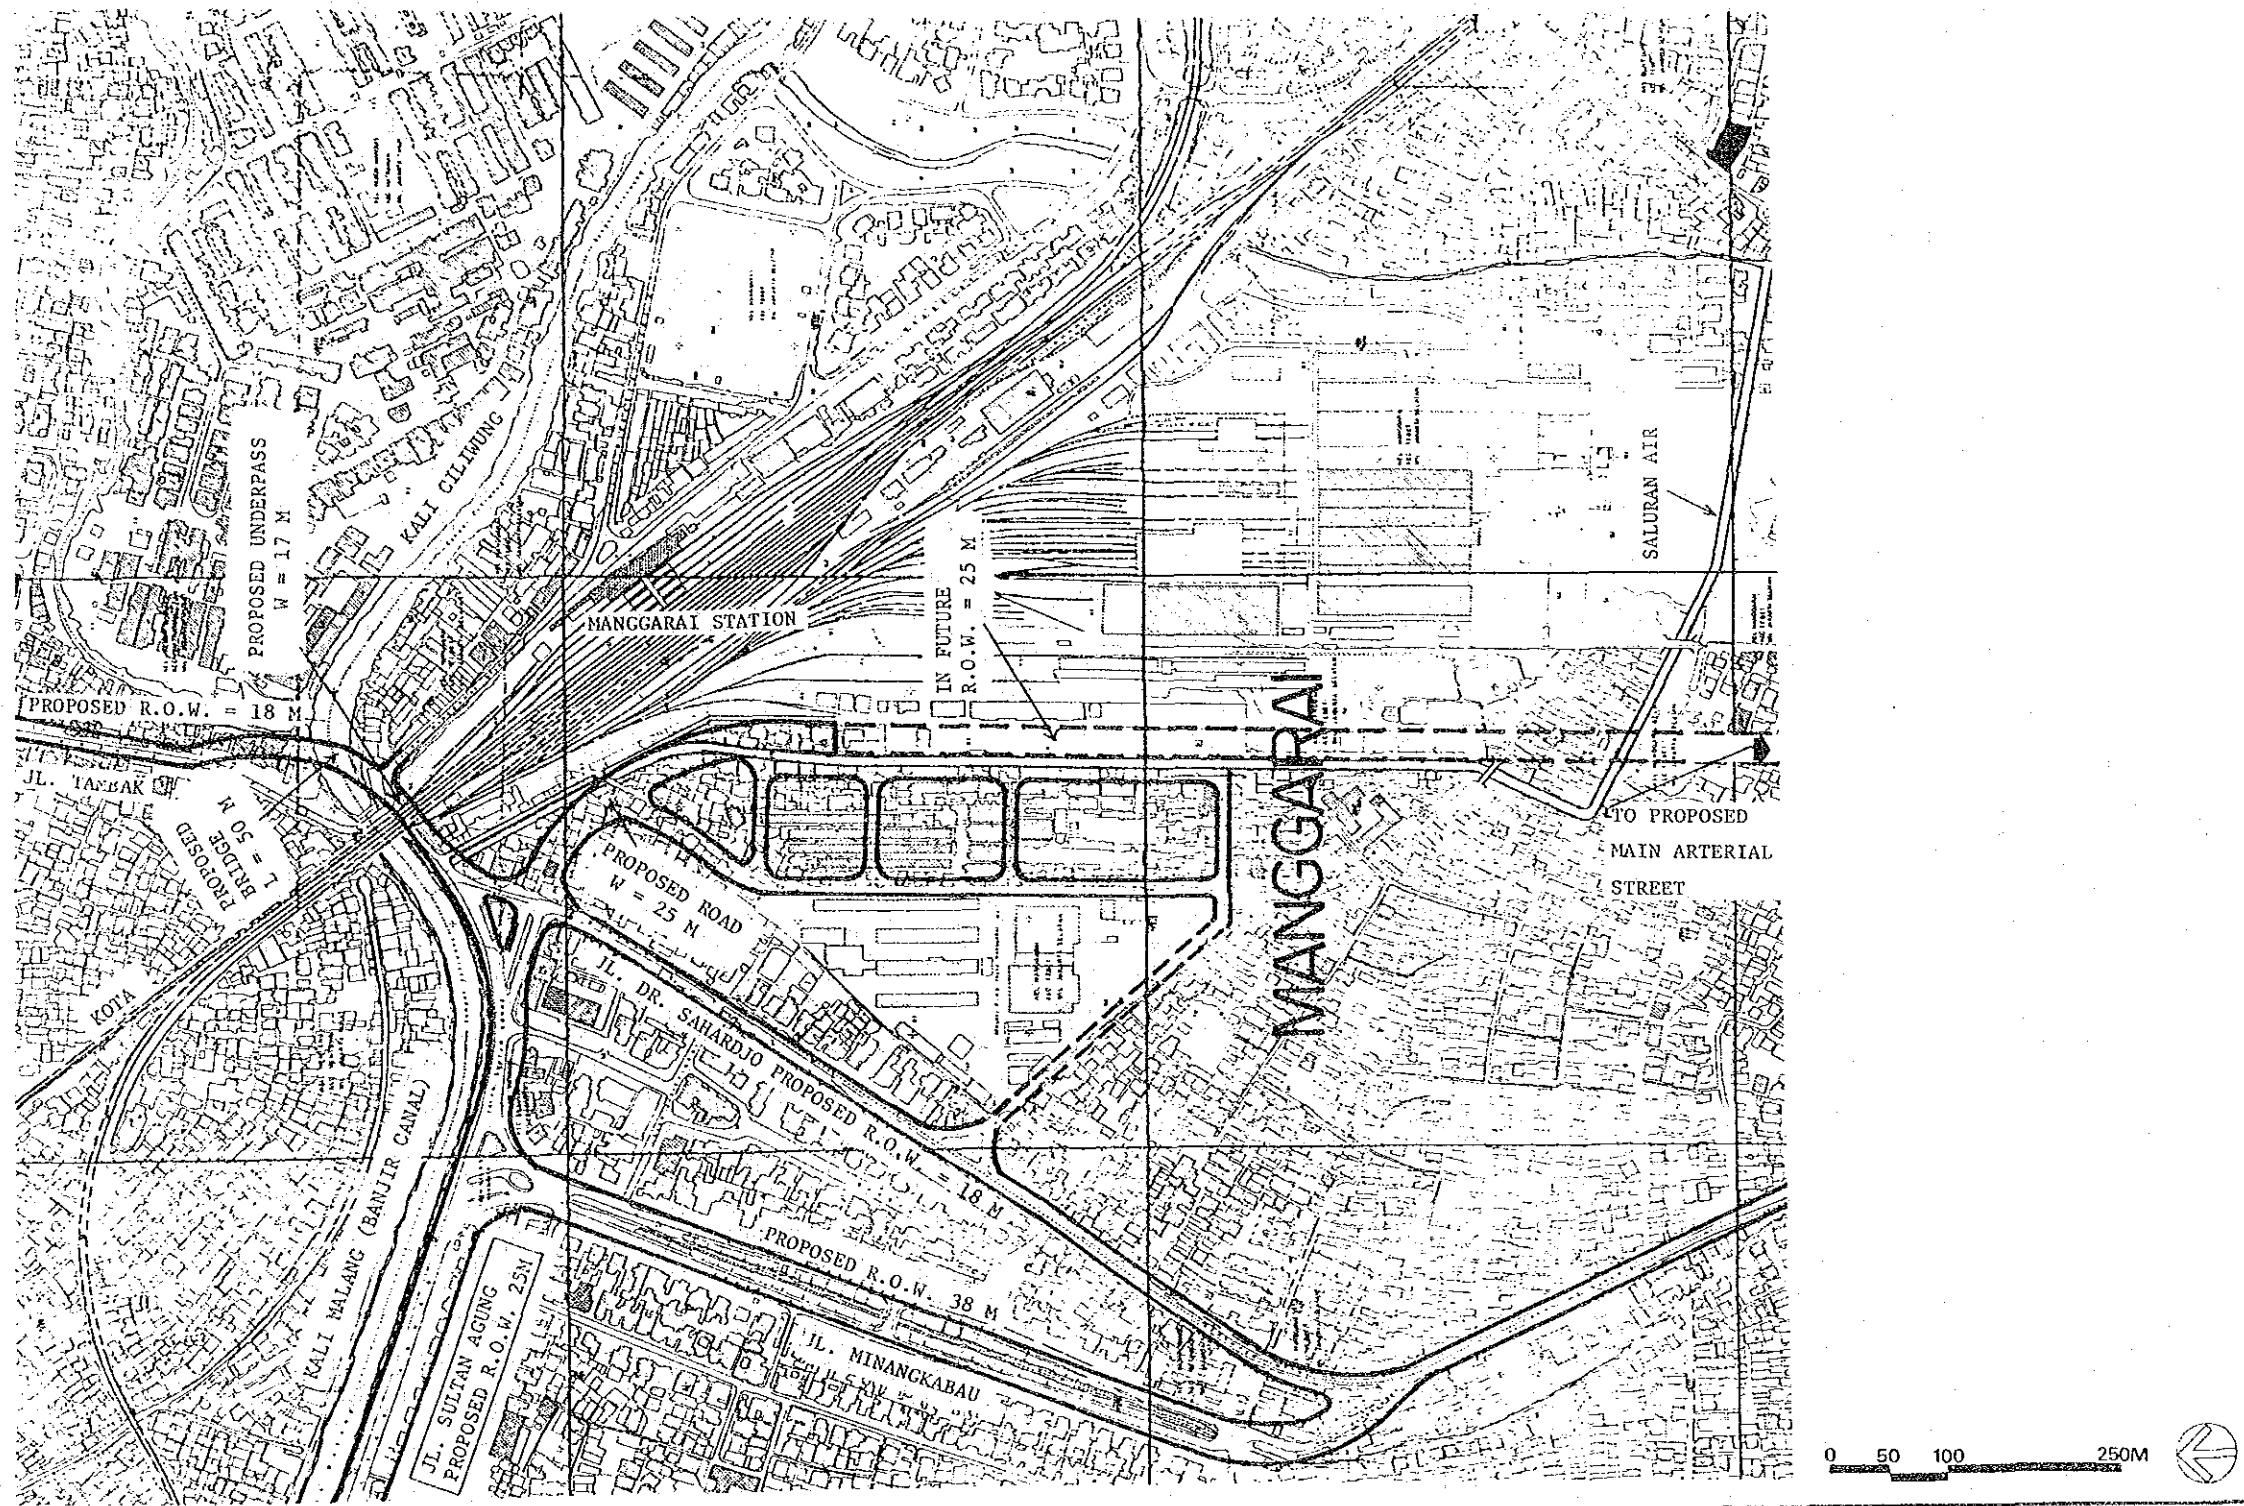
PROPOSED ROADS' UNDERPASS AND A BRIDGE IN MANGGARAI
